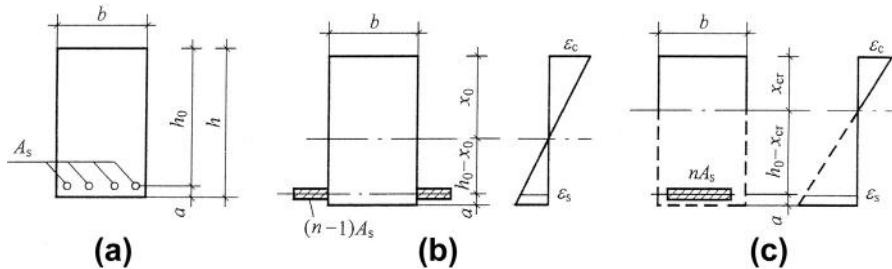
Converted sections before and after cracking of concrete: (a) initial section, (b) before cracking, (c) after cracking
